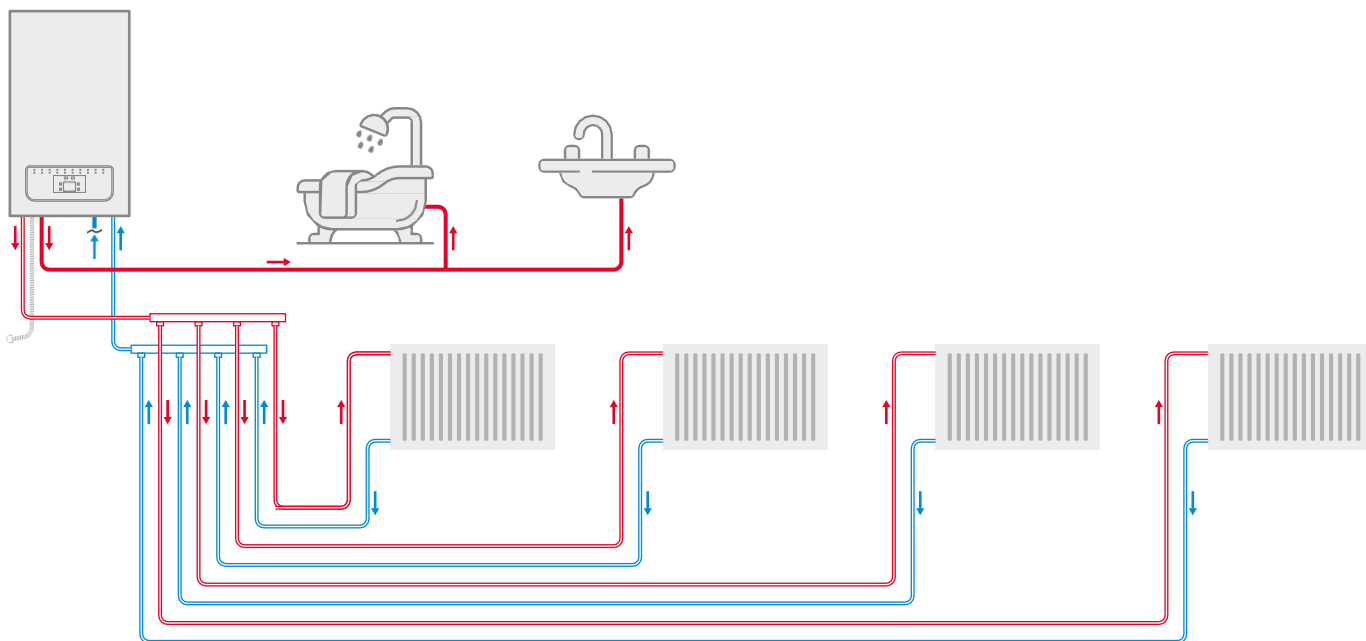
Scheme of use of the combi in a mobile tubular distributed heating installation system.
